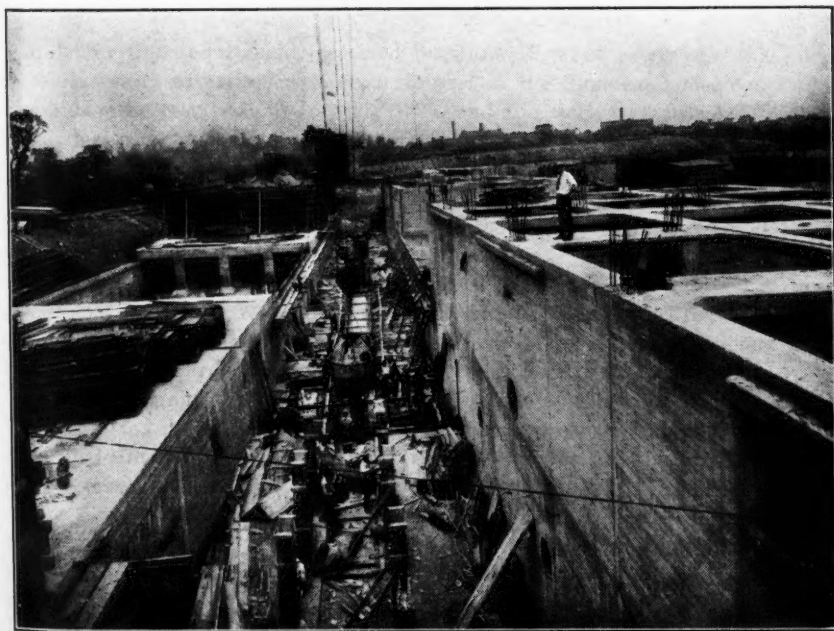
PIPE GALLERY AND FILTER TANKS DURING CONSTRUCTION, BALDWIN FILTRATION PLANT.
